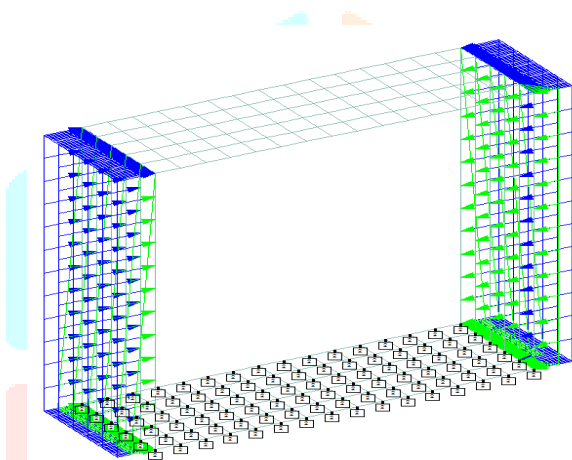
Submerged earth pressures on side wall of RCC culverts
